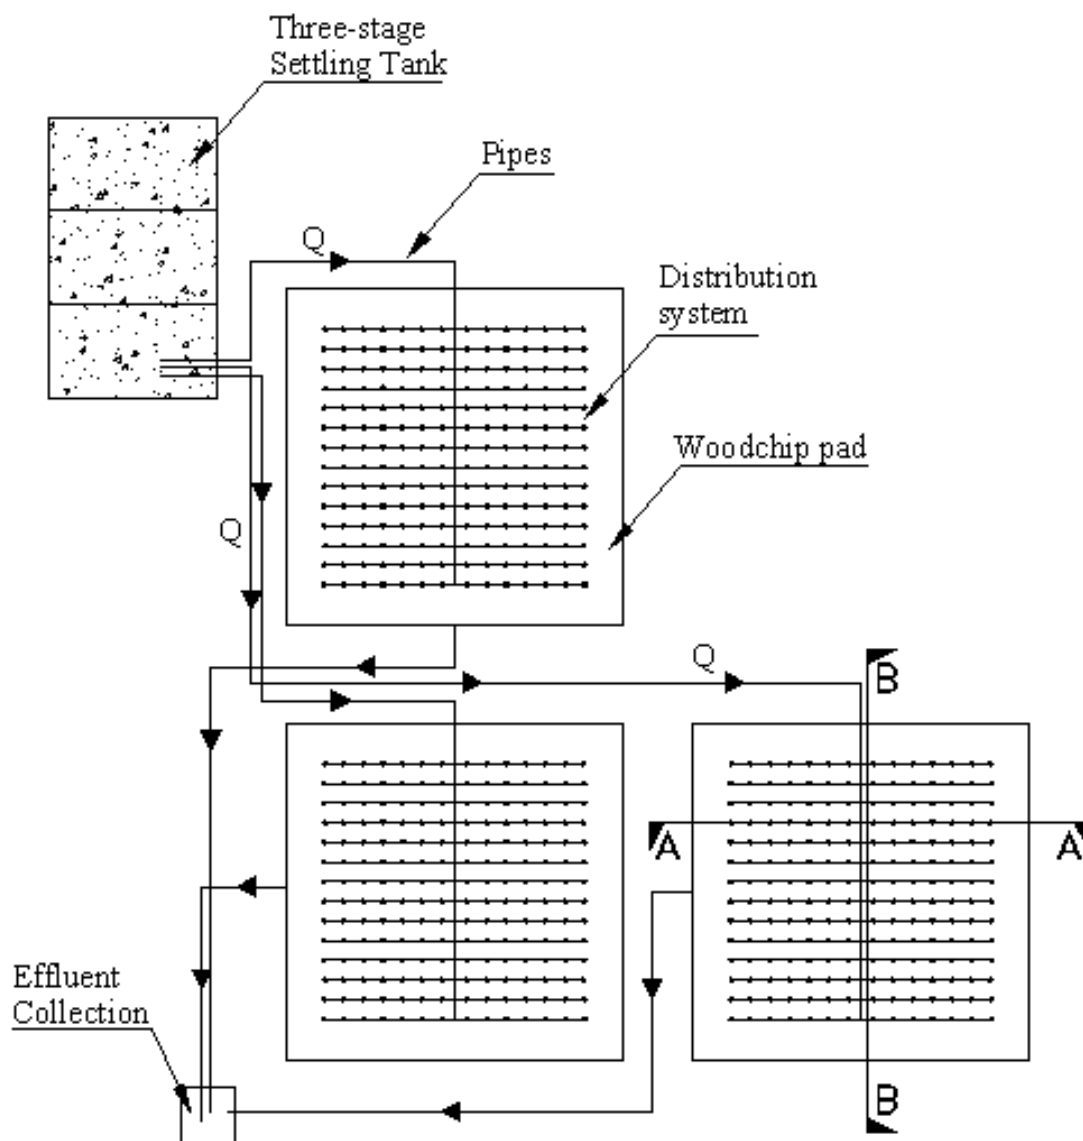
Schematic plan view of three farm scale woodchip filters.
